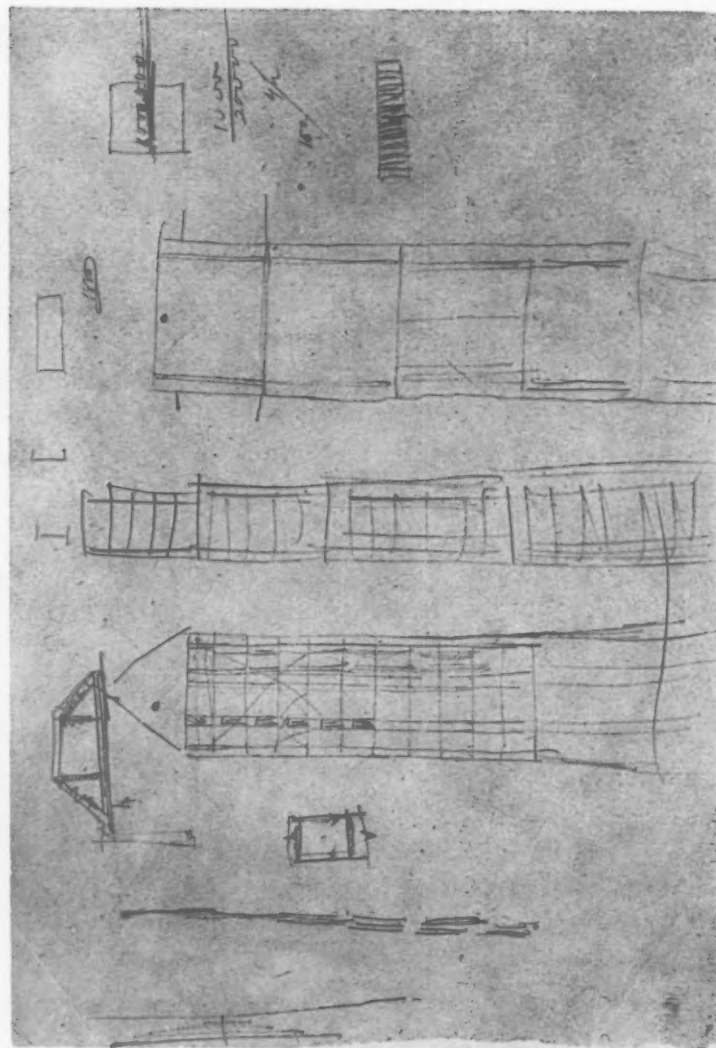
Sections and Details for 28-Story Building, Dated 1885
